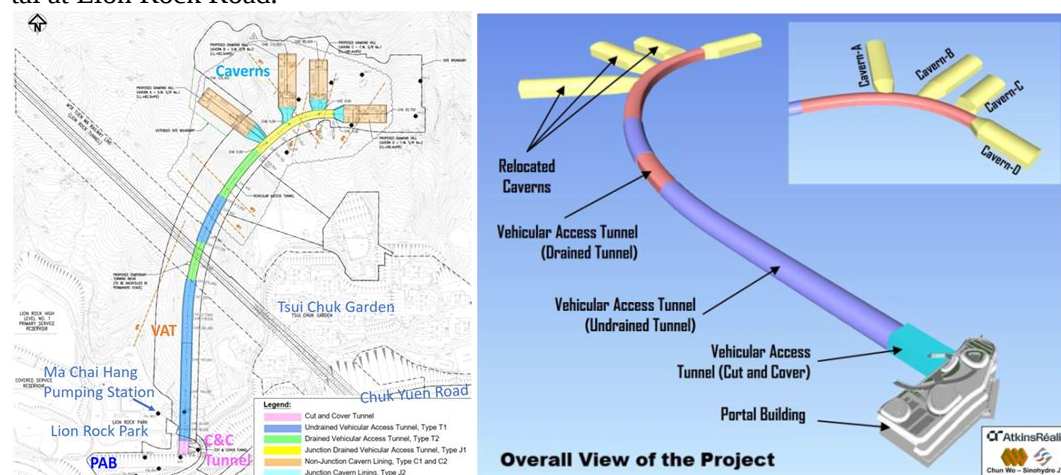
Project layout (a) and plan view of the proposed VAT and Caverns (b).
